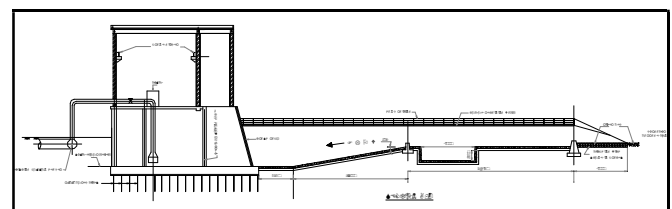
B: Sectional Elevation of Approach Channel for DSTPS Intake
